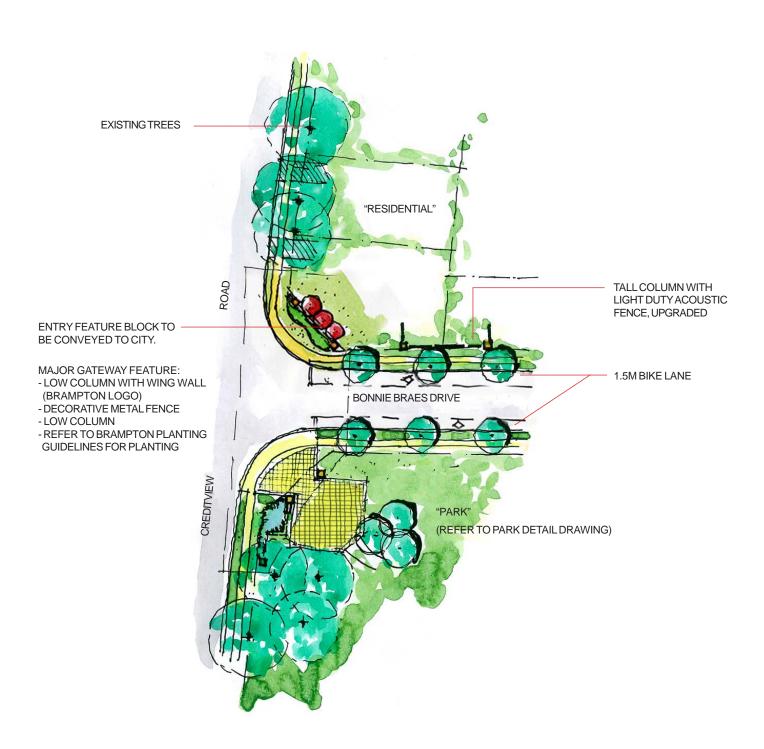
Creditview Road and Bonnie Braes Drive - conceptual street elevation.
